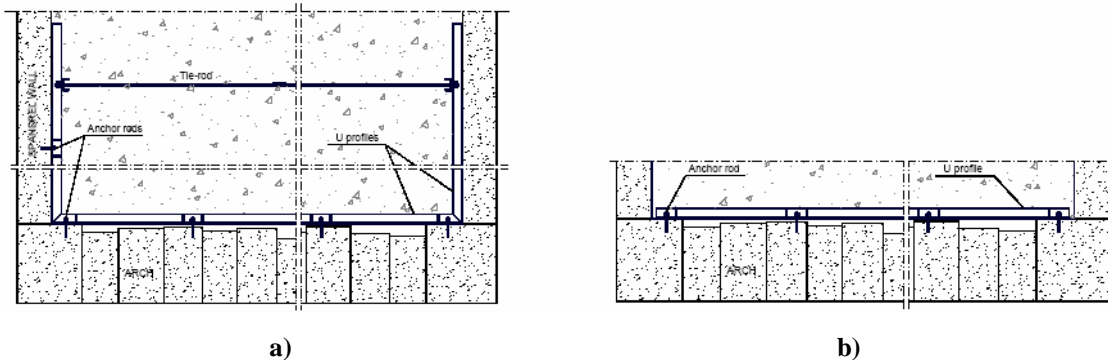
Strengthening of arch A1 with metallic profiles
